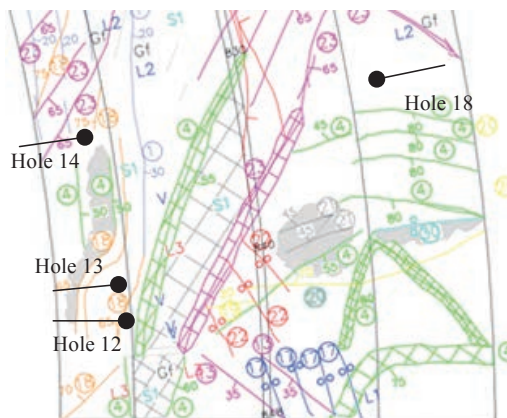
Mapping of a tunnel section, section 0/848-0/827 in tunnel 214.
